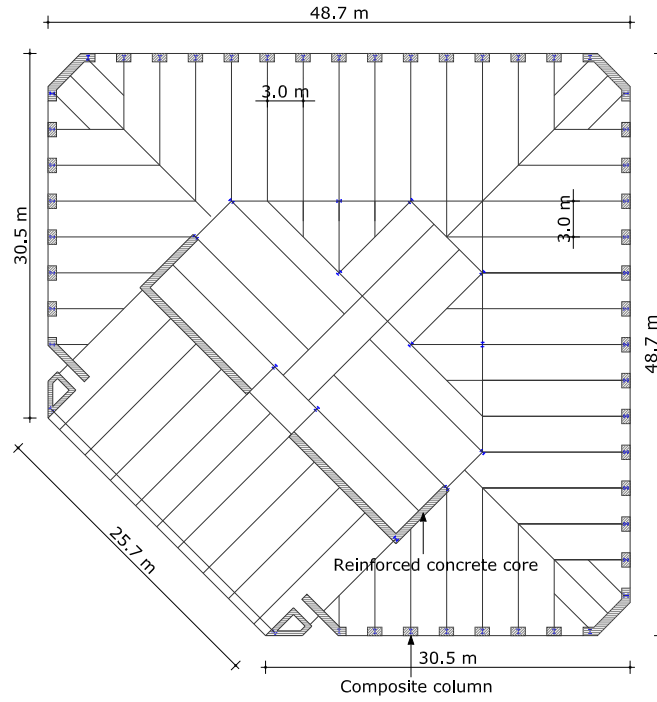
Texas Commerce Tower – typical floor framing plan
